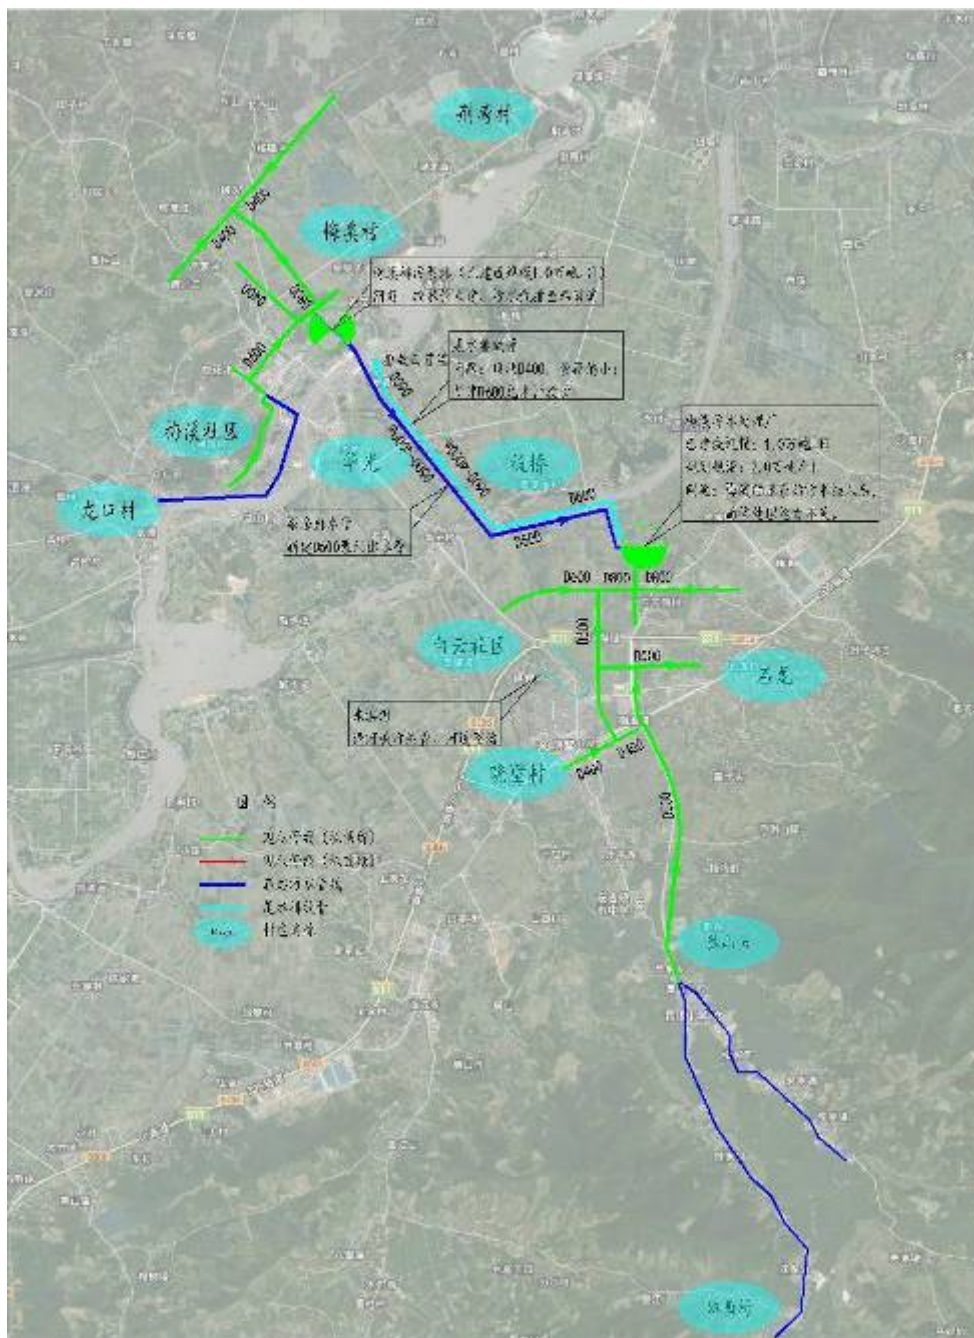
Construction Schematic Drawing of Drainage System of Anji Meixi River
